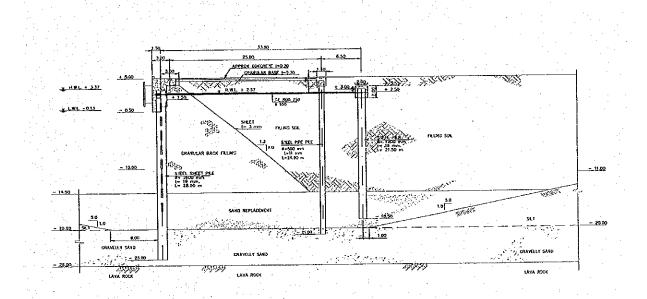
Alternative 2 Vertical Steel Pile
